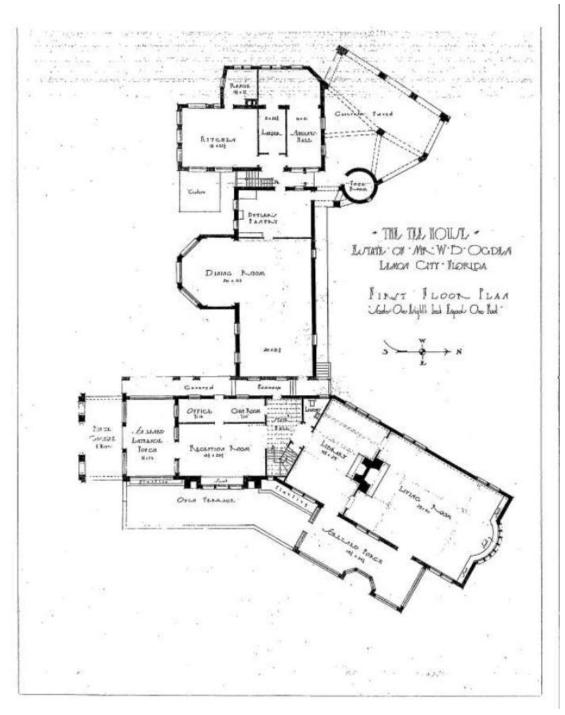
Tee House Plantation, Lemon City, Florida. History Miami Archives
